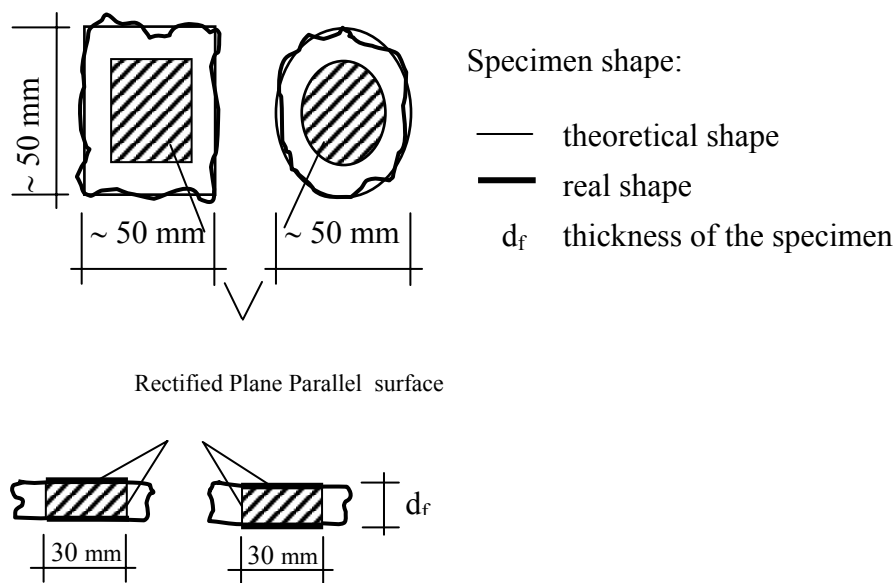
Shape and dimensions of the specimens [acc.to DIN18555-9]
